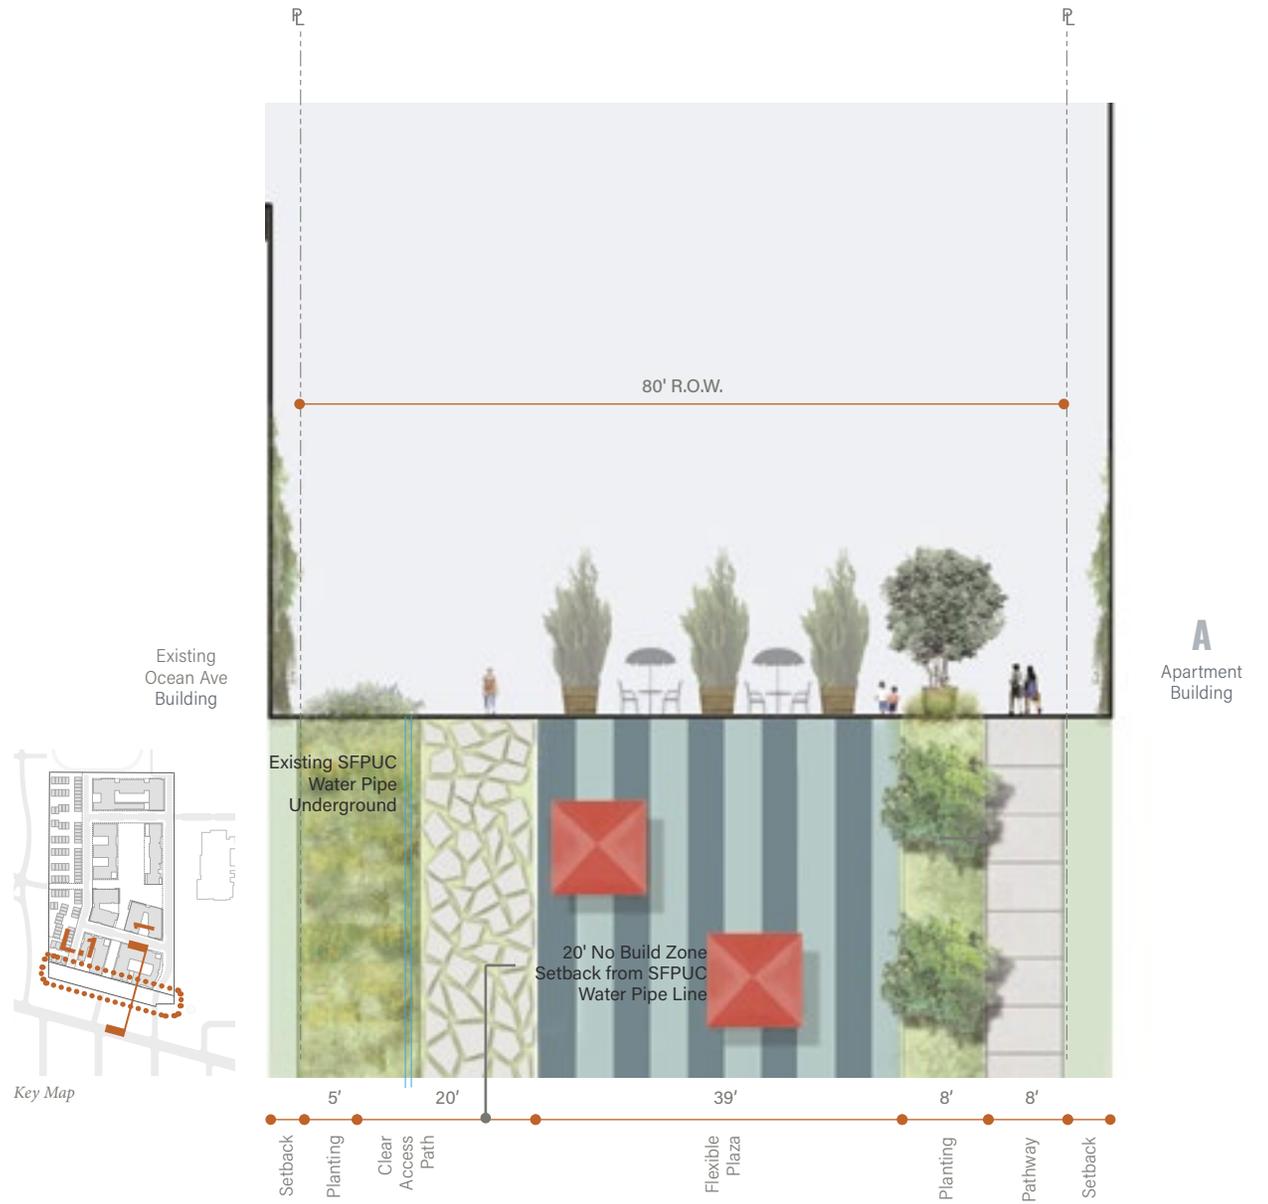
SFPUC Retained Fee Open Space Section
